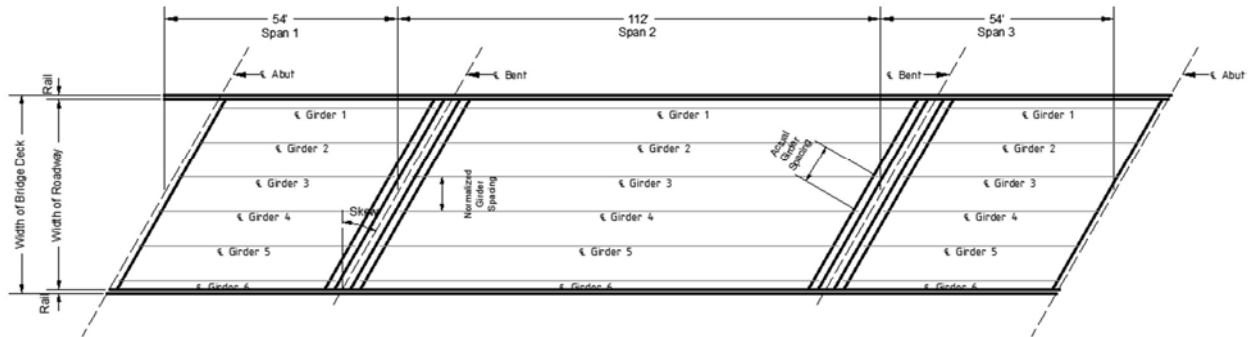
Top View of the 60 Degrees Skewed ITBC with Spans and Girders
